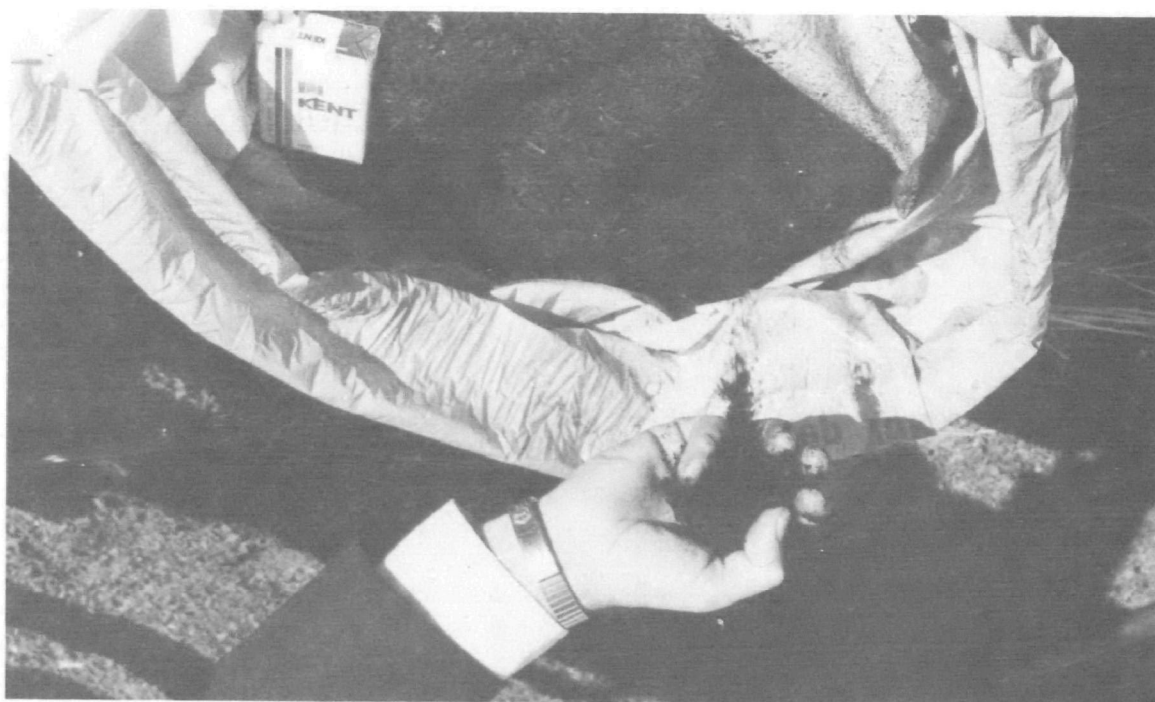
Reclaimed rubber in bag used in Sections 24, 25, 26. 10/18/76
